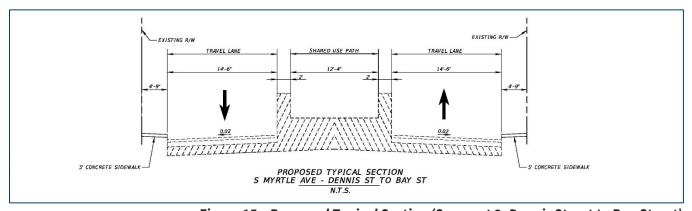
Proposed Typical Section (Segment 2, Dennis Street to Bay Street)
